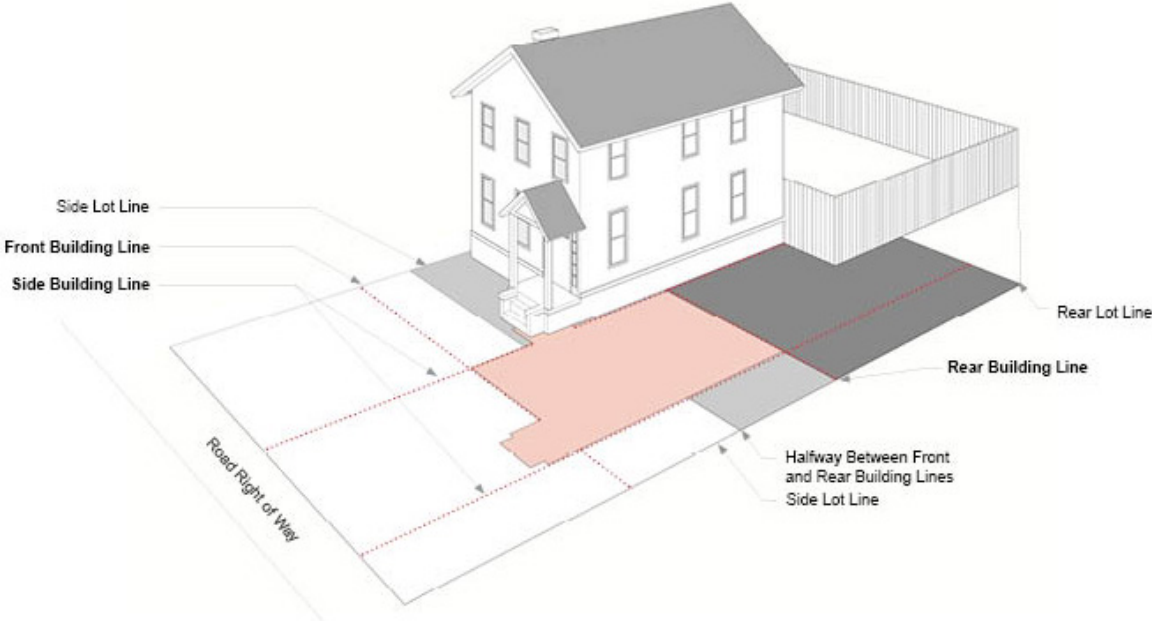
a: House on Interior Lot –Fence behind half-way point of front and rear building lines
